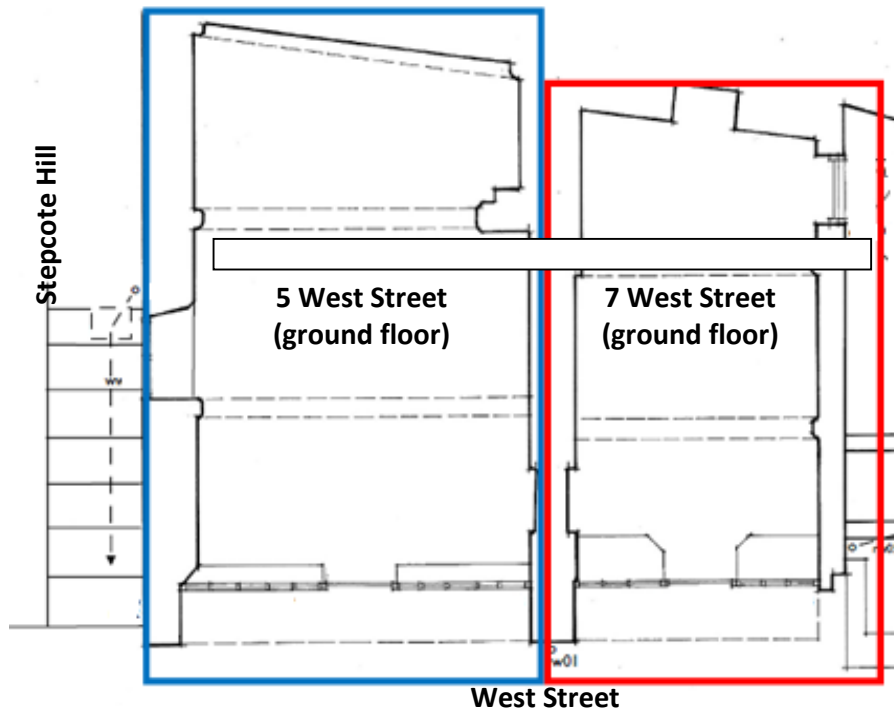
/b: Plans of the West Street/Stepcote Hill site to show layout and arrangement of the building (after Simon Cartlidge | Architect 2016)
